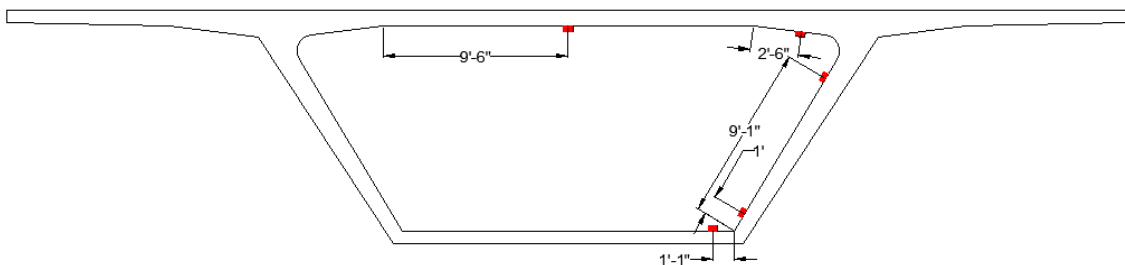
Section C Transverse Strain Sensor Locations, Looking North
